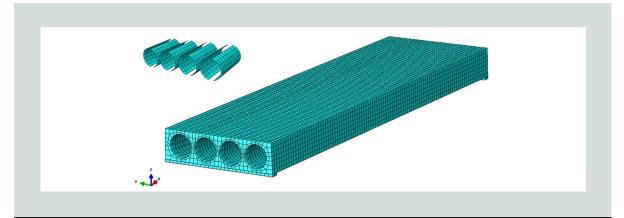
Three-dimensional view of the prestressed concrete hollow-core slab finite element model.
